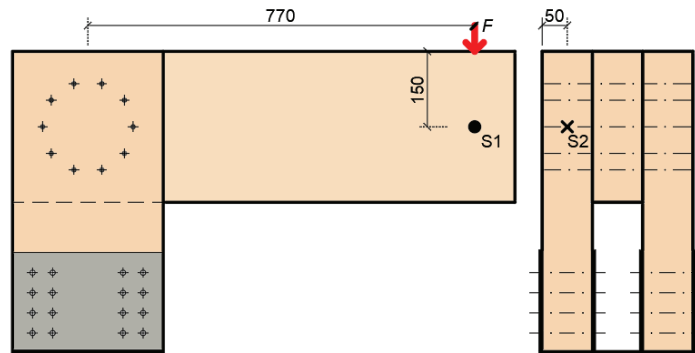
Position of strain gauge sensors: front view (on the left), side view (on the right).
